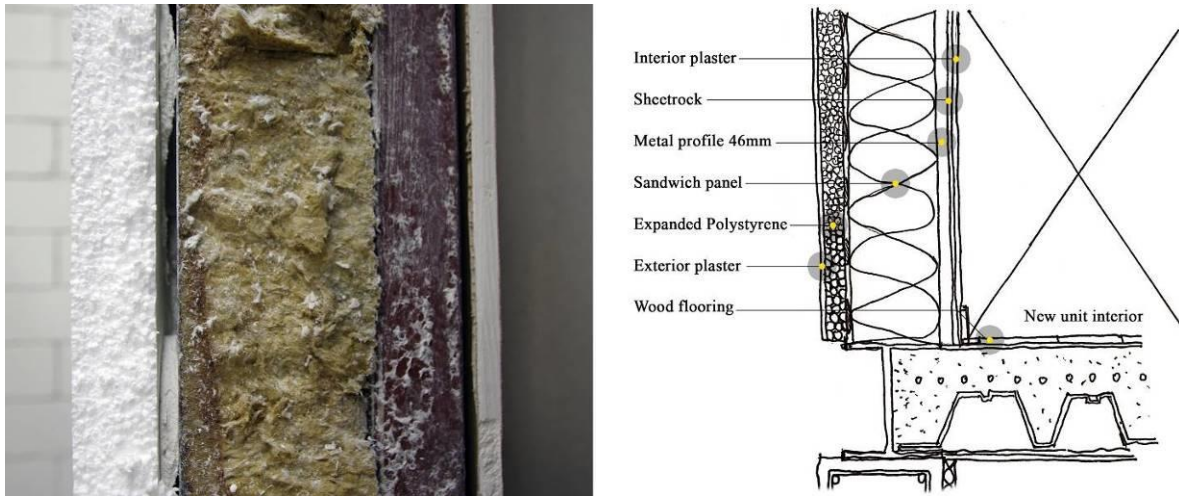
Left: Image of an exterior wall under construction at Gava's factory. Right: Sketch developed by the author with all the elements from the wall. May 30, 2018
